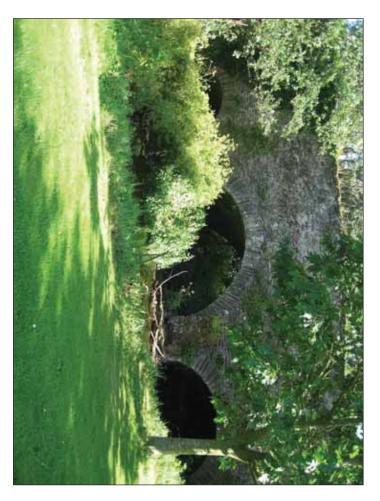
Northern elevation of Copperalley Bridge in grounds of Riverstown House
